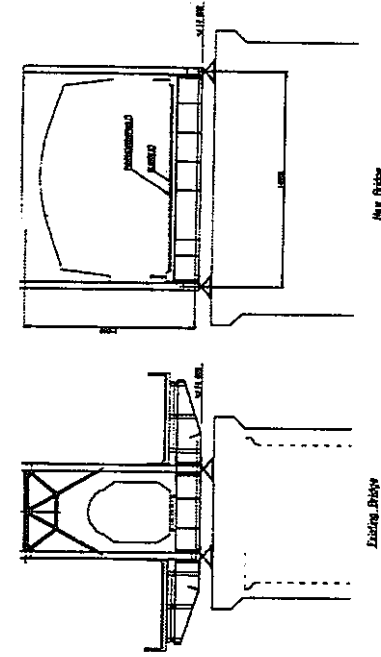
General Arrangement of New Duong Bridge (Road Bridge: Truss)
